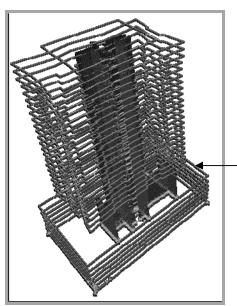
3-Dimensional Model of Existing Shear Walls
